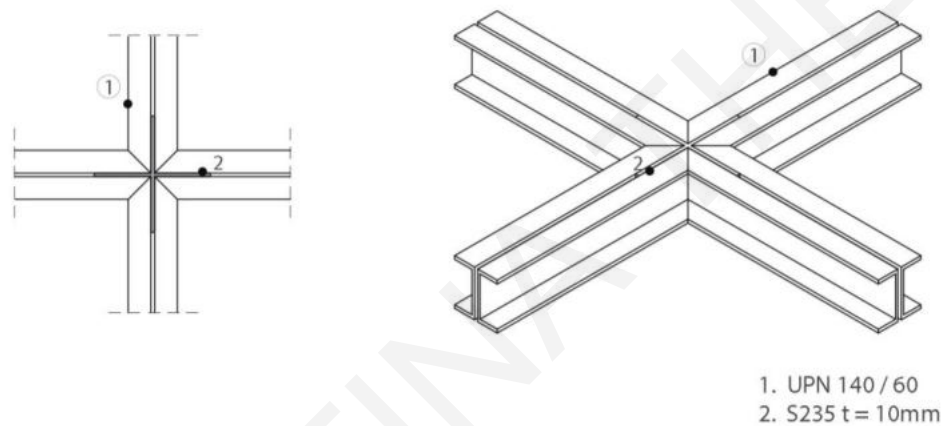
Connection principle of beams of structural grid, Scale 1:10
